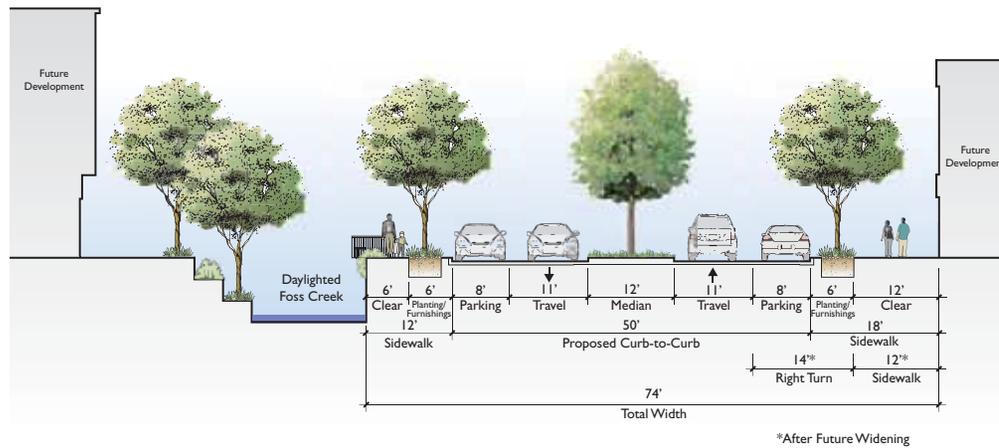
Central Healdsburg Avenue at Mill Street Intersection: Long-term Improvements (looking north)
